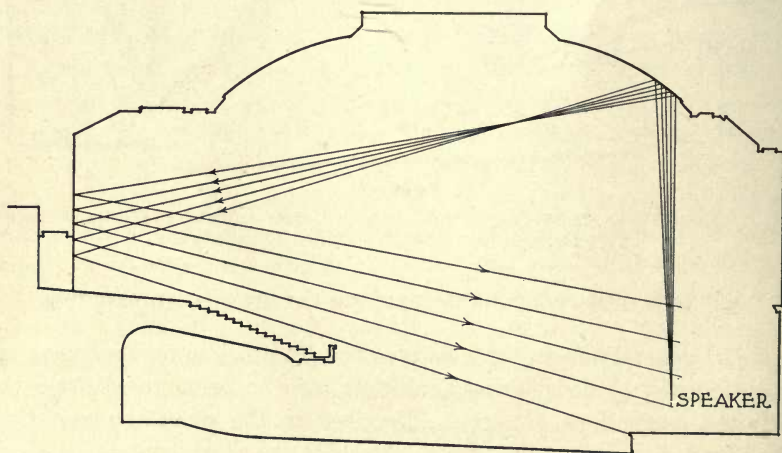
LONGITUDINAL SECTION SHOWING FORMATION OF ECHO ON THE STAGE.
